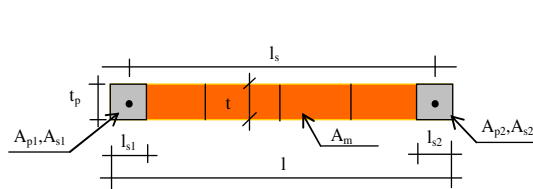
Confined masonry shear wall with concrete pillars - horizontal section
